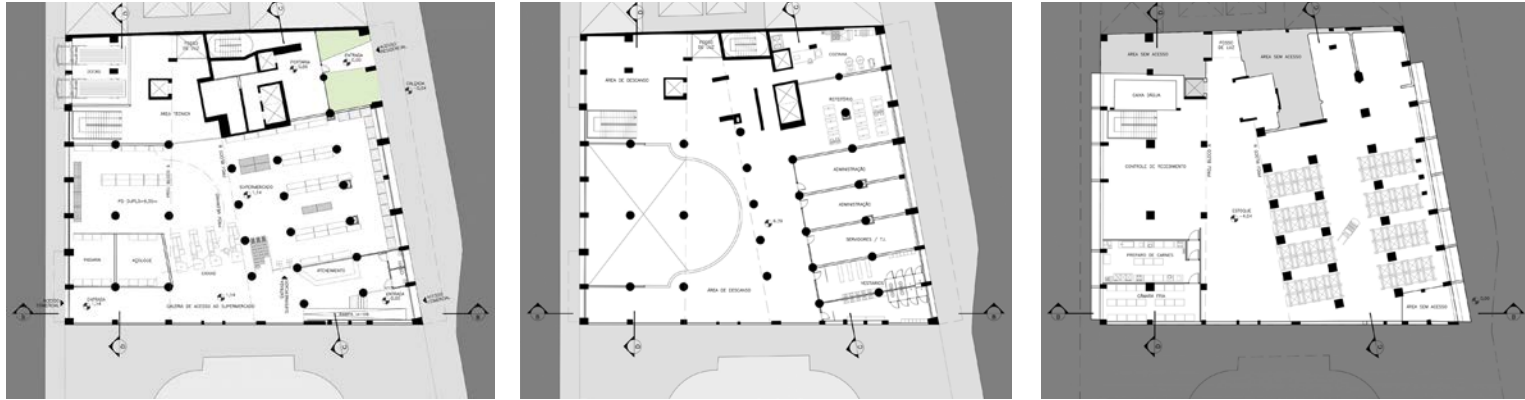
Plans for the ground floor, the mezzanine and the basement.
